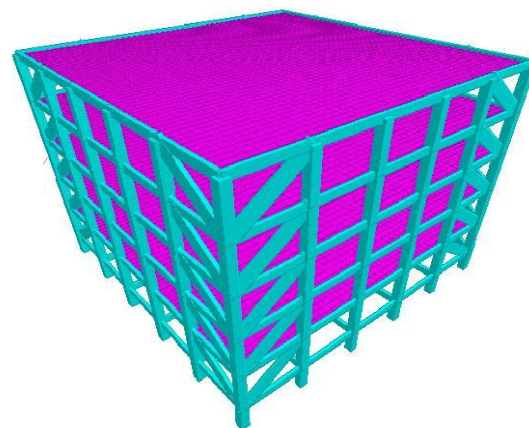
Model of Flat Slab building with Masonry Infill Wall
